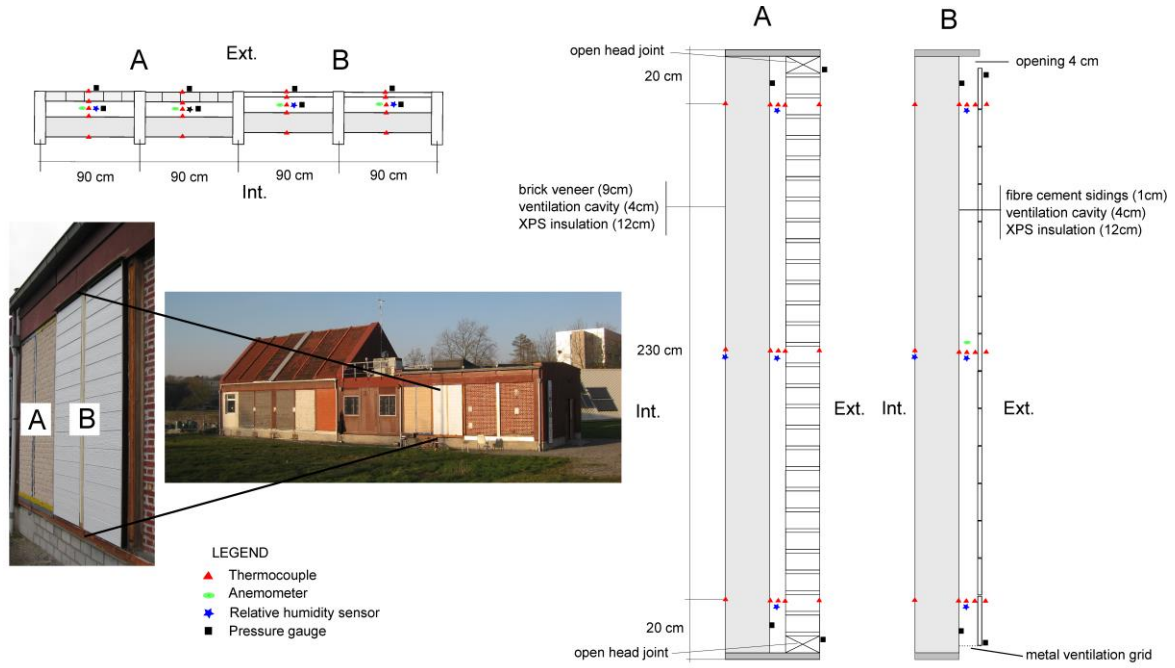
Southwest façade of the VLIET test building with (A) brick veneer test wall and (B) test wall with fibre cement sidings.
